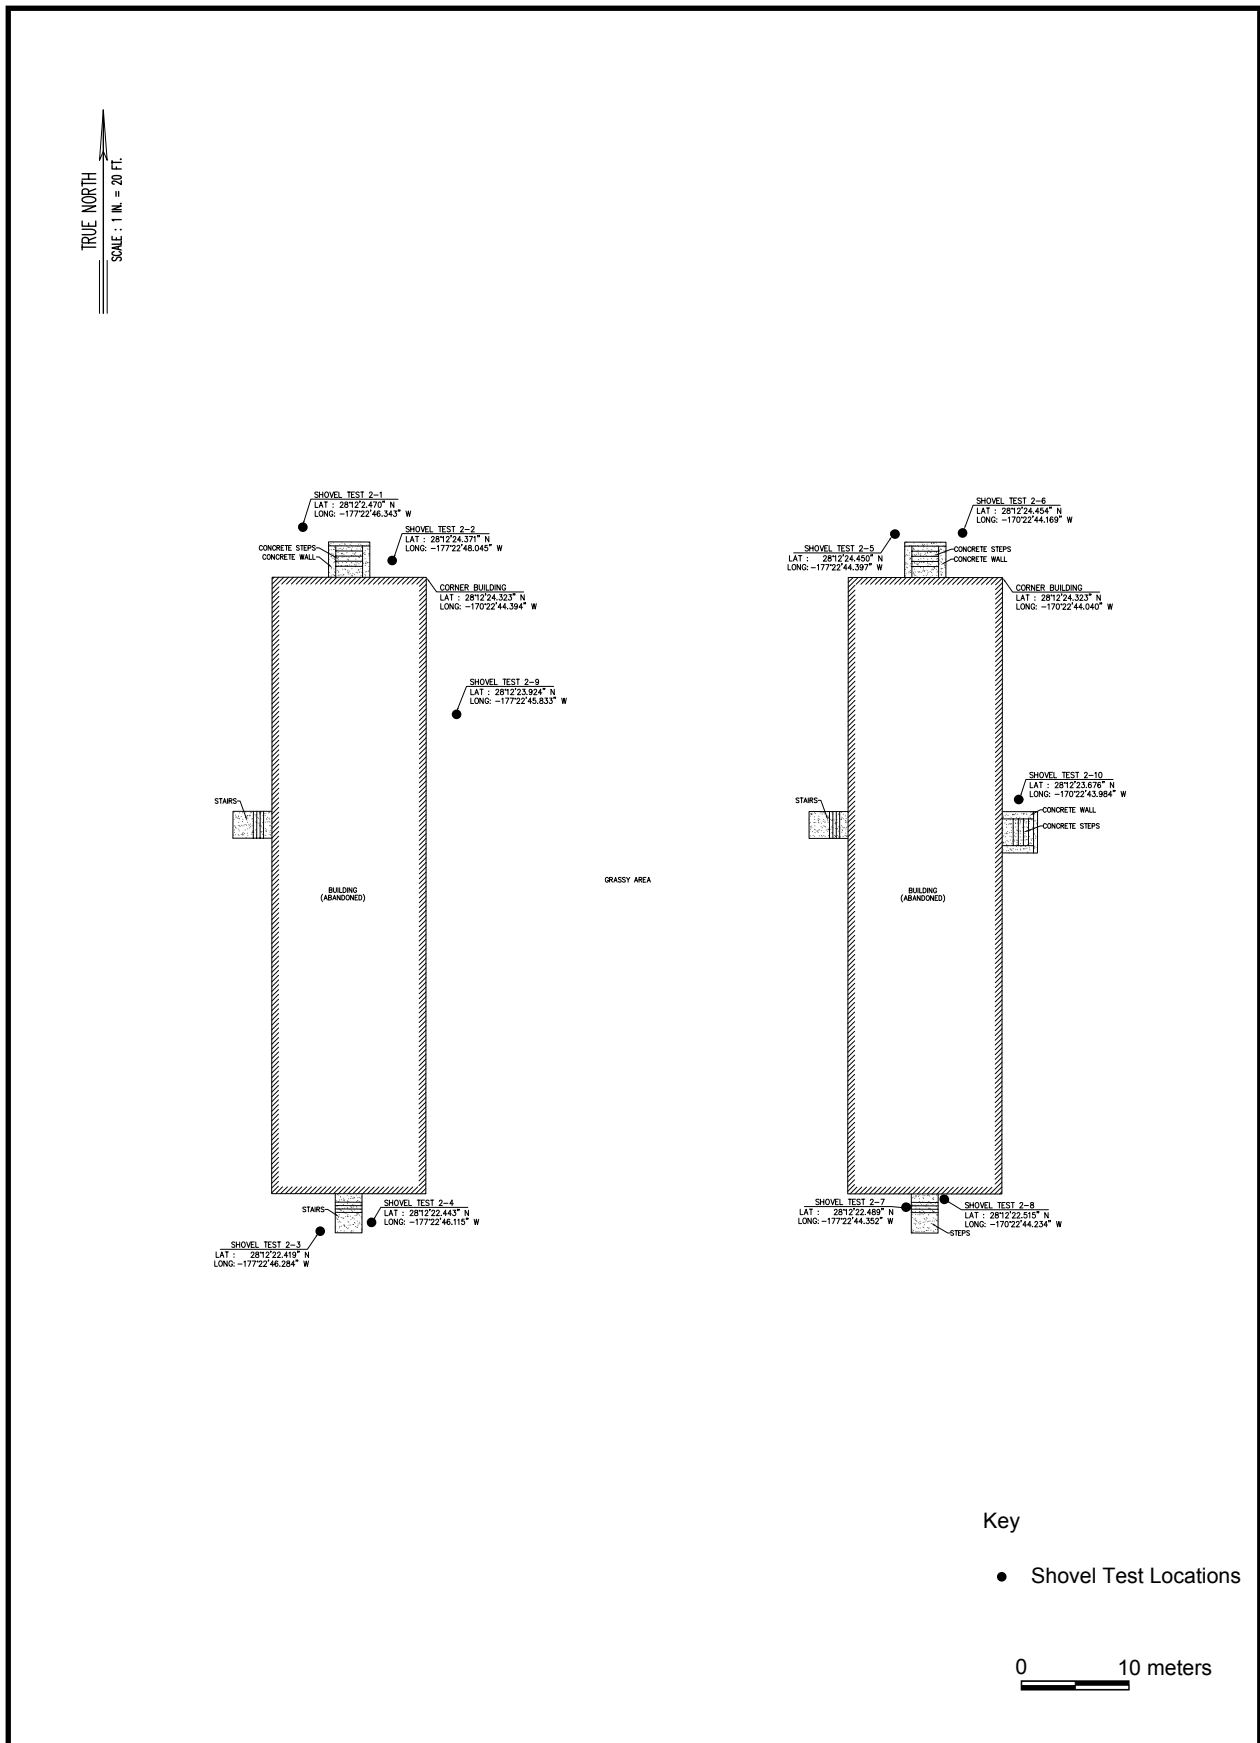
Site 50-93-01-002, Plan View, Showing Shovel Test Locations.
